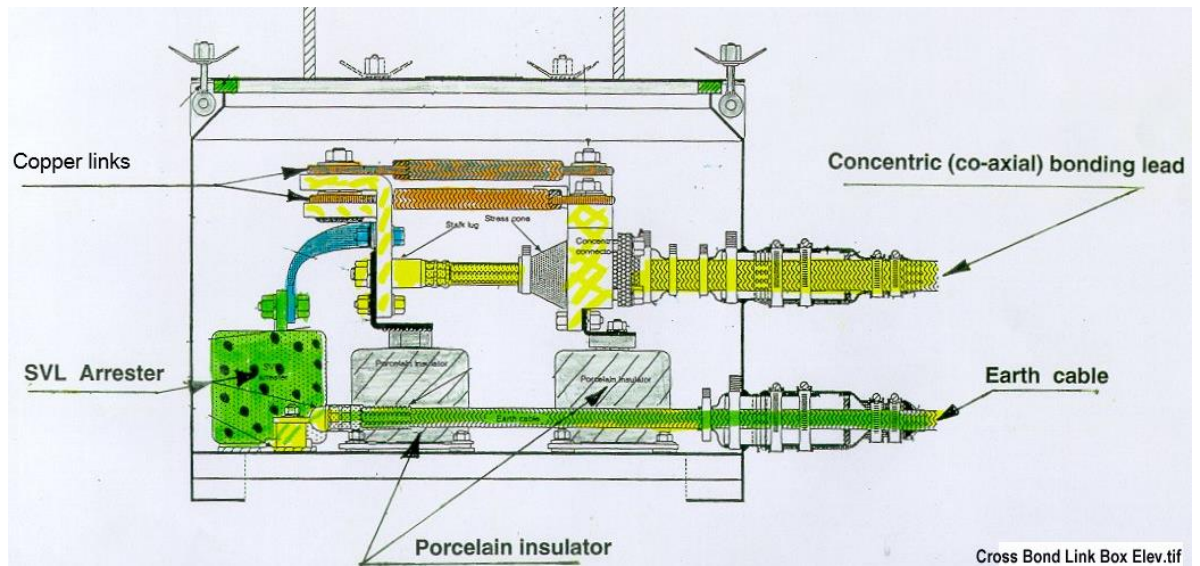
Typical Diagram of Link-Box in Underground Concrete Pit
